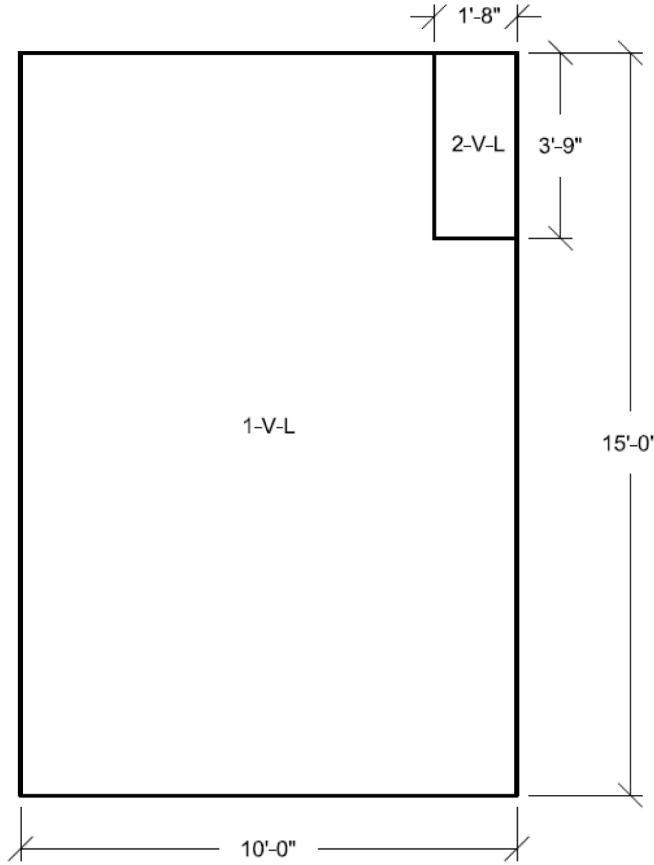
H.6-203A DGFOSV Wall 15 Looking From Outside
